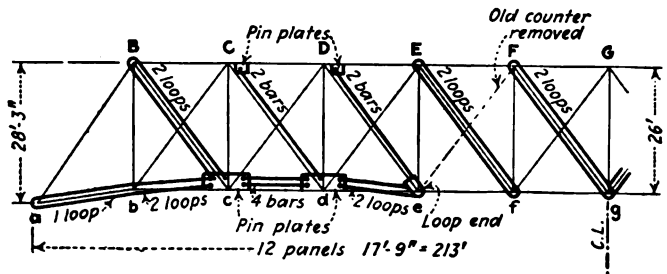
REINFORCEMENT OF MIDDLE TRUSS
